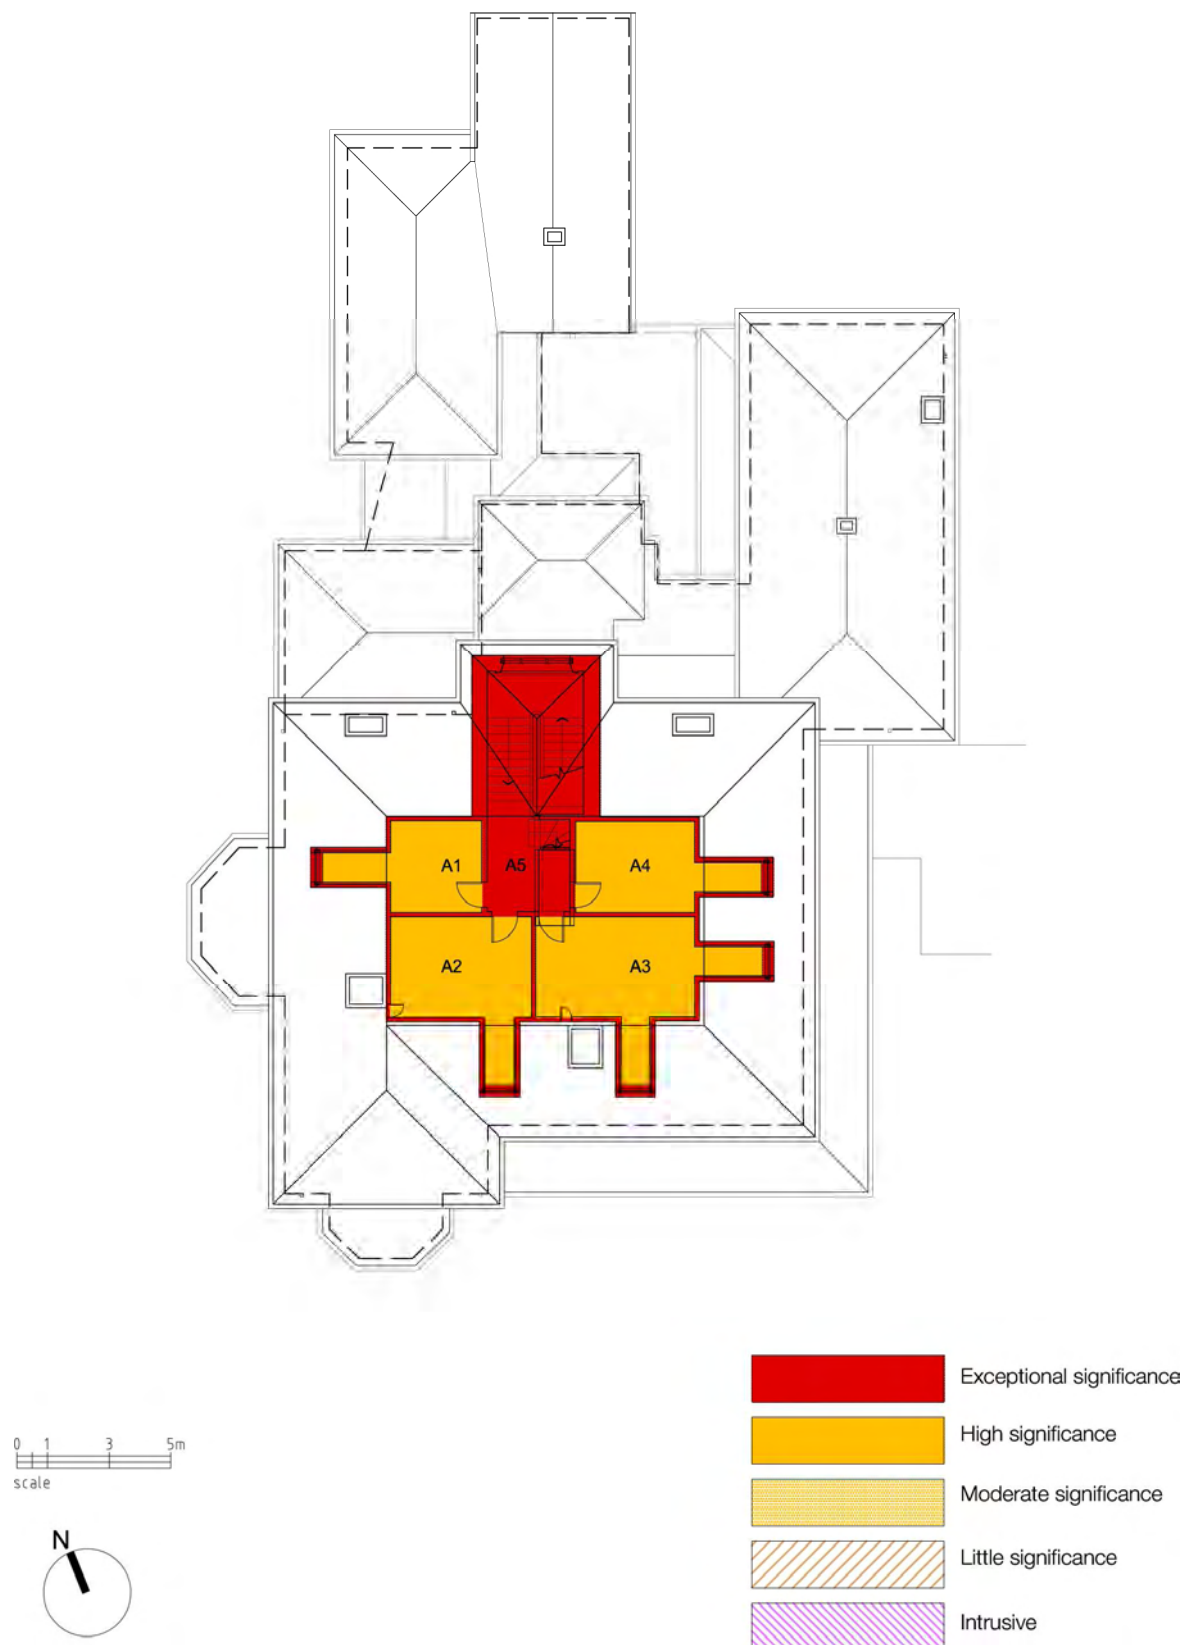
Attic floor plan of Graythwaite House, levels of significance.
